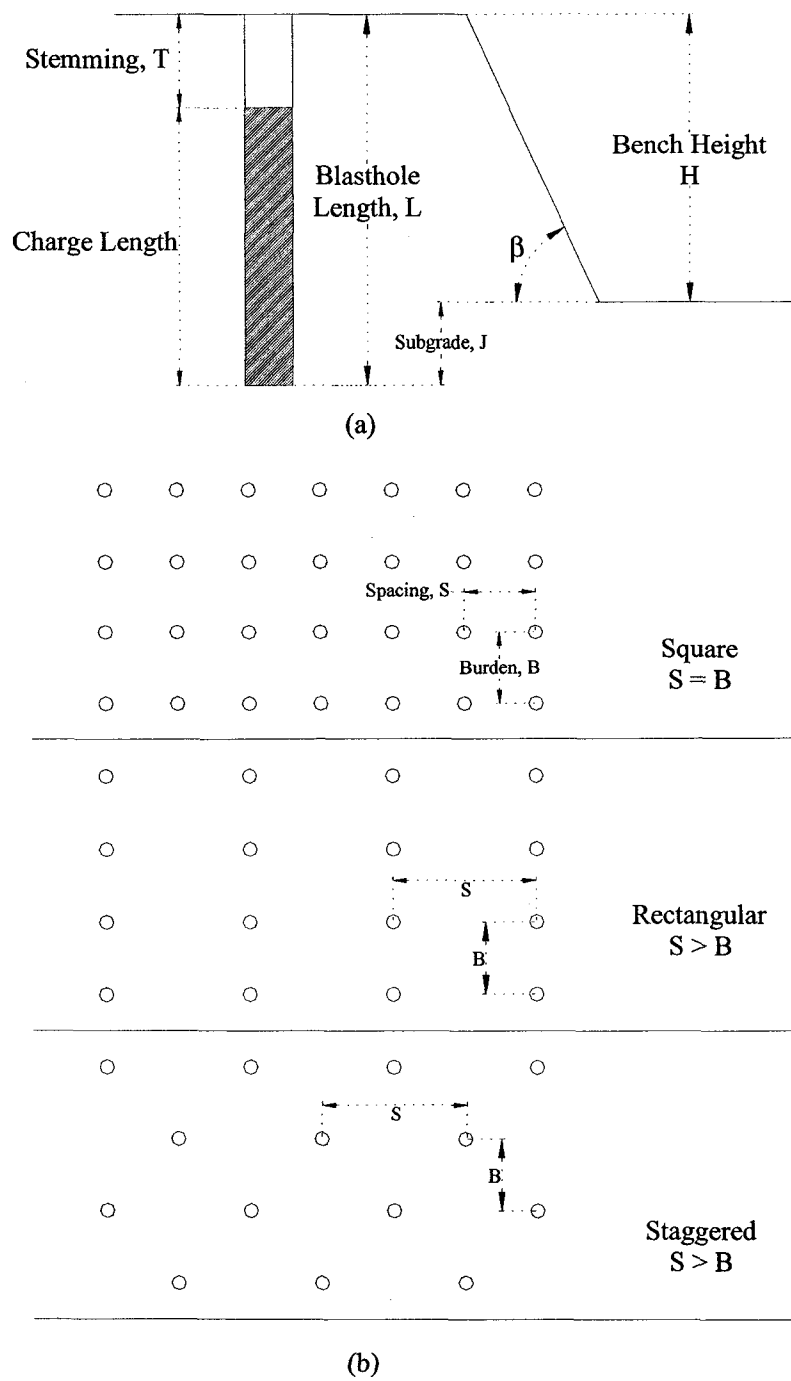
Blasthole section view (A) showing terminology used in design and (B) pattern array for layout of holes
